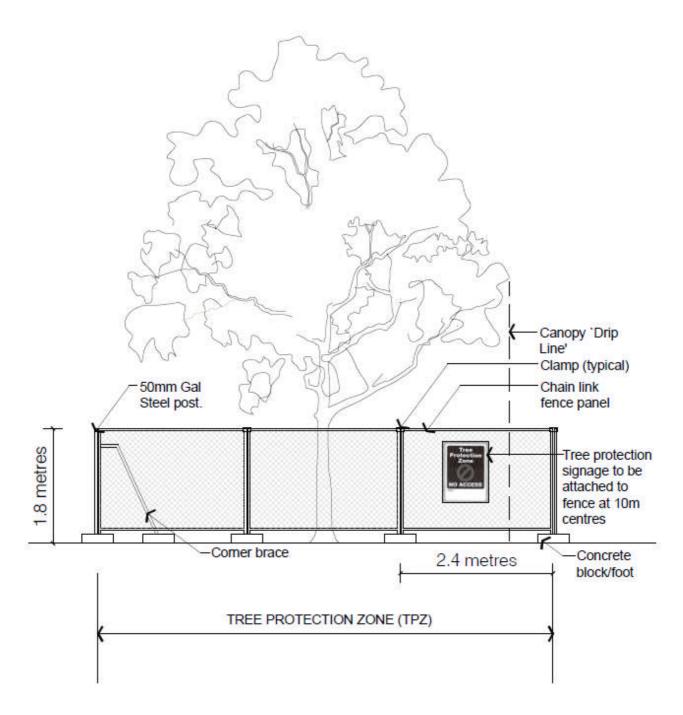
Tree Protection Fence detail. Source – AS 4970-2009 Protection of trees on development sites, p16
